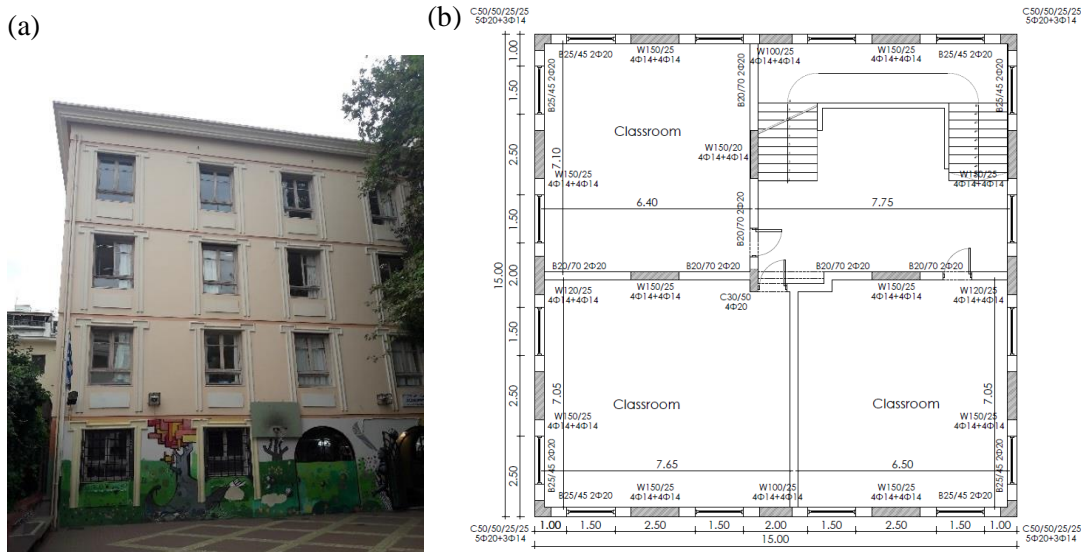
(a) Facade view and (b) typical plan view with the main structural and geometrical characteristics.
